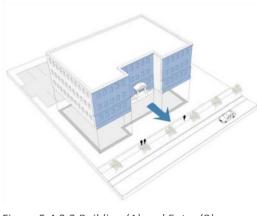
Building (A) and Entry (B) Orientation to the Street
